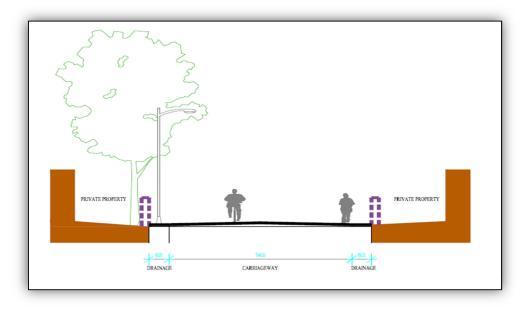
Road section for ROW 9 m at Chutto Chowk Road
